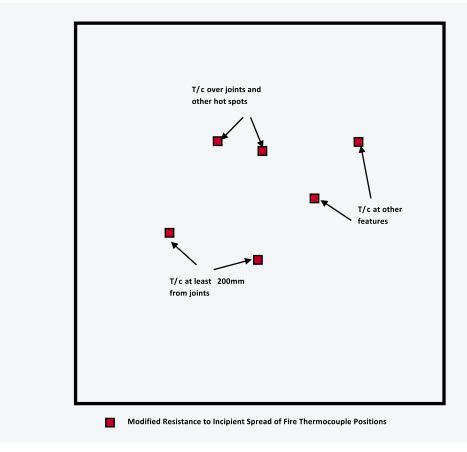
Elevation of a wall showing modified RISF thermocouple positions.
